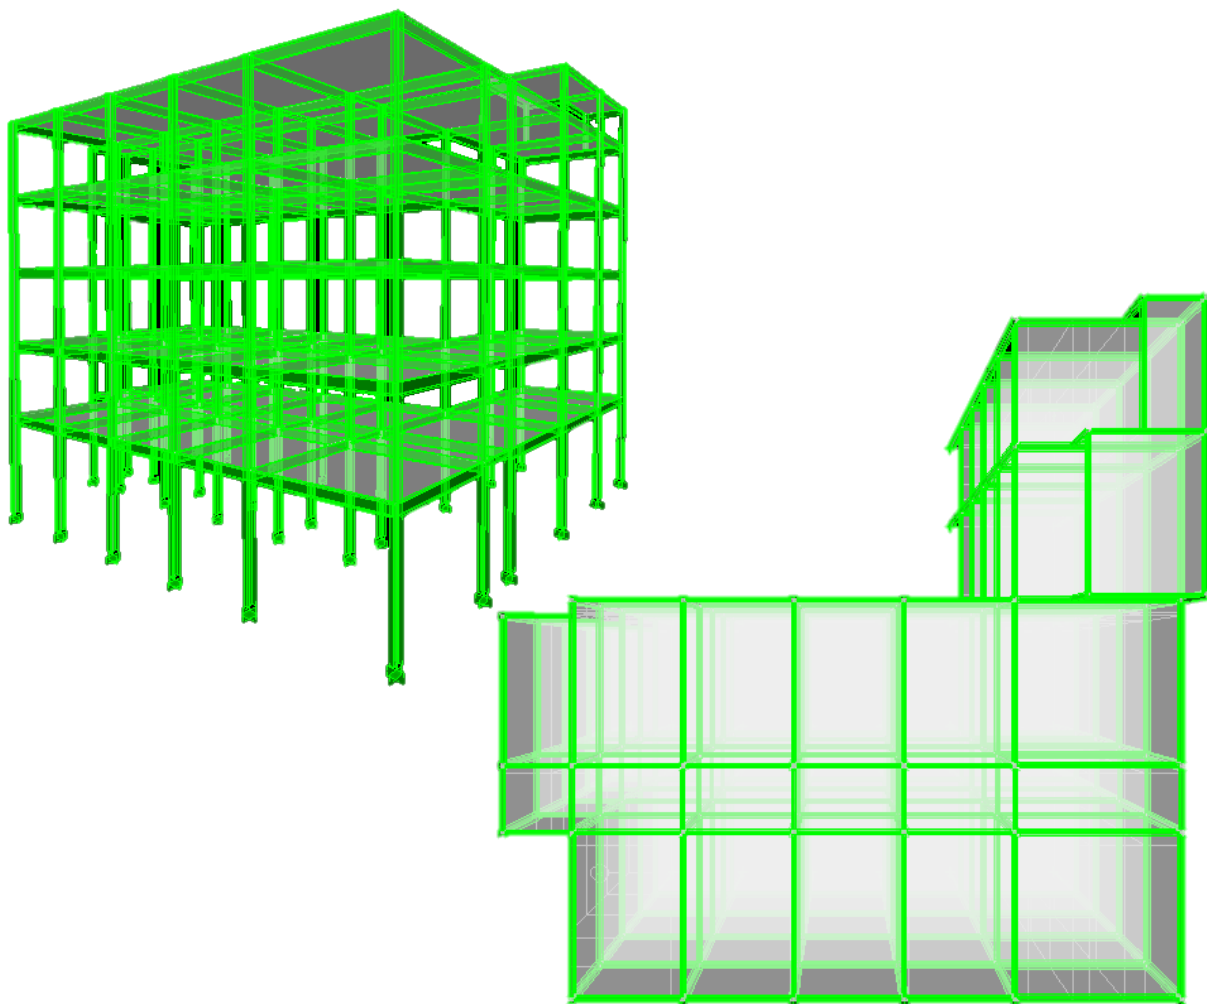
Two views of the ETABS model used to determine earthquake and wind loads on individual members. The top is an extruded view fo the structure while the bottom image is a bird's eye view.
